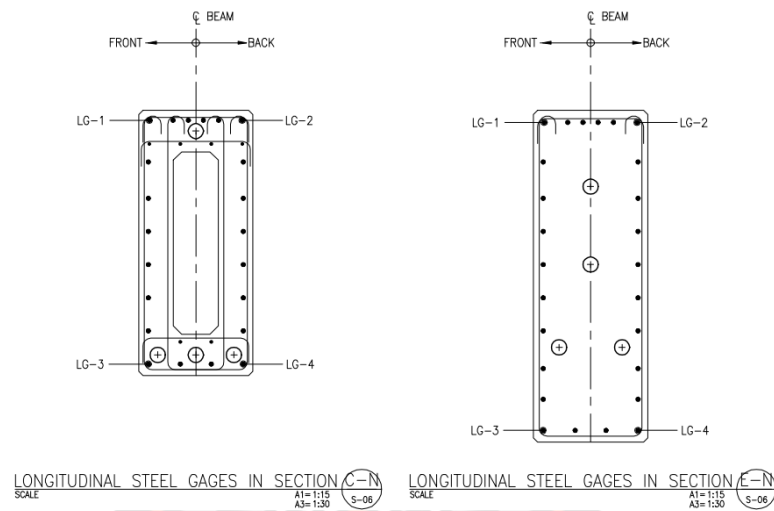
Sectional details of steel strain gauges (longitudinal steel bars)
